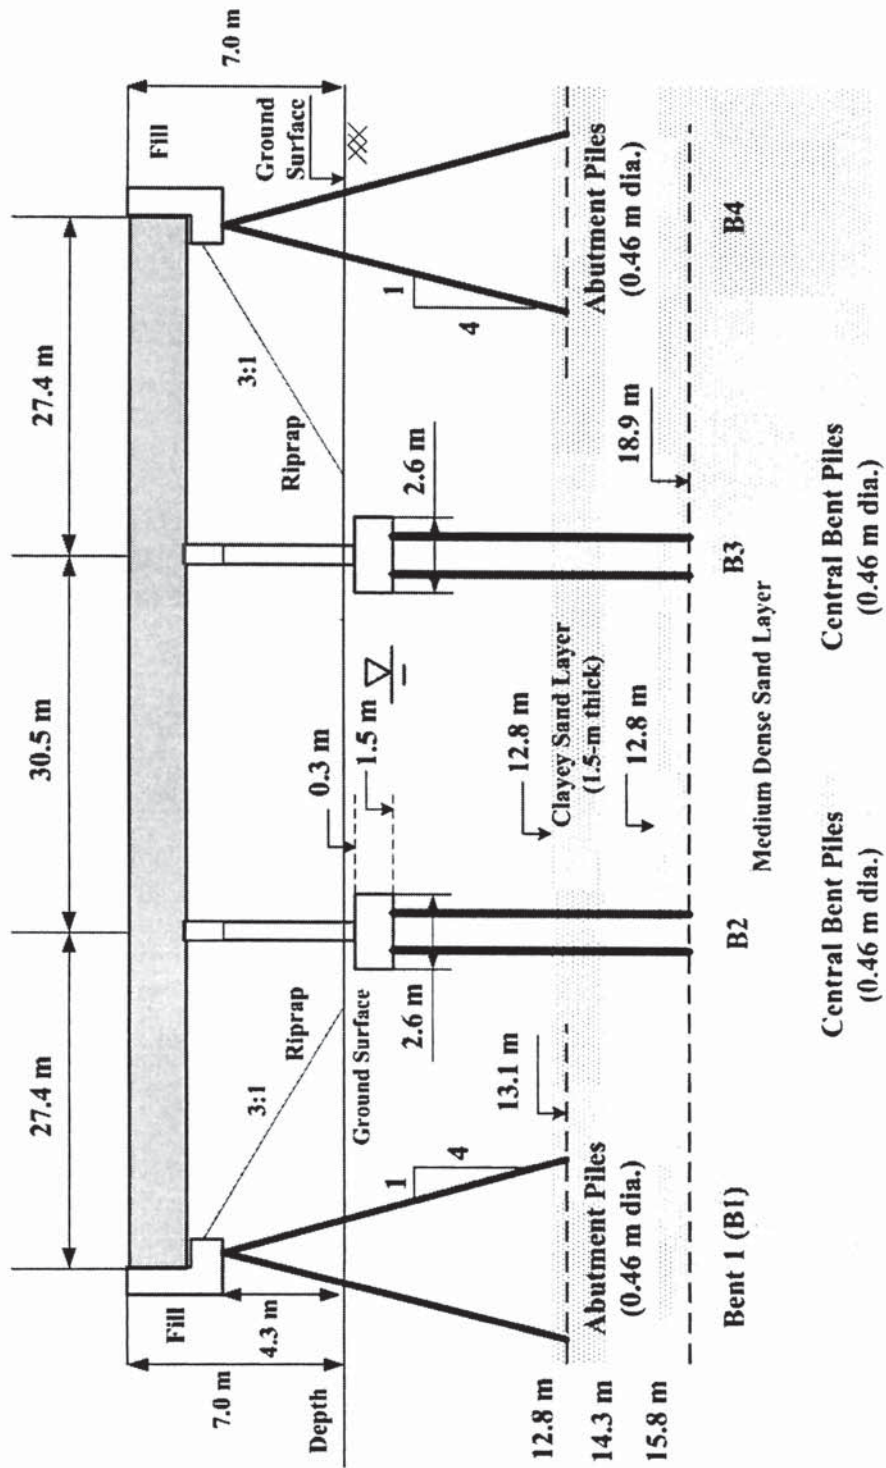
Schematic Elevation of the Krenek Road Bridge
